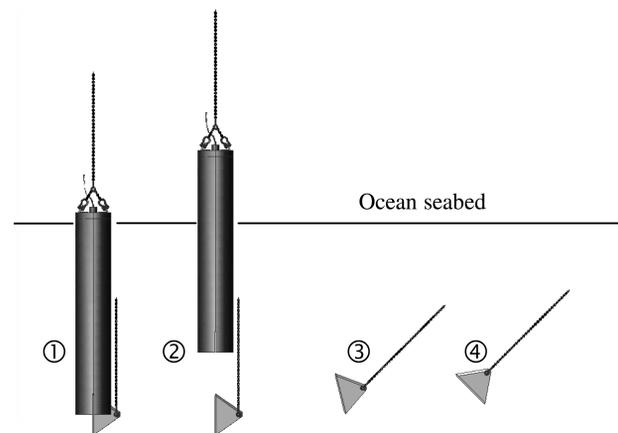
SEPLA concept: ① suction installation, ② caisson retrieval, ③ anchor keying, ④ mobilised anchor
